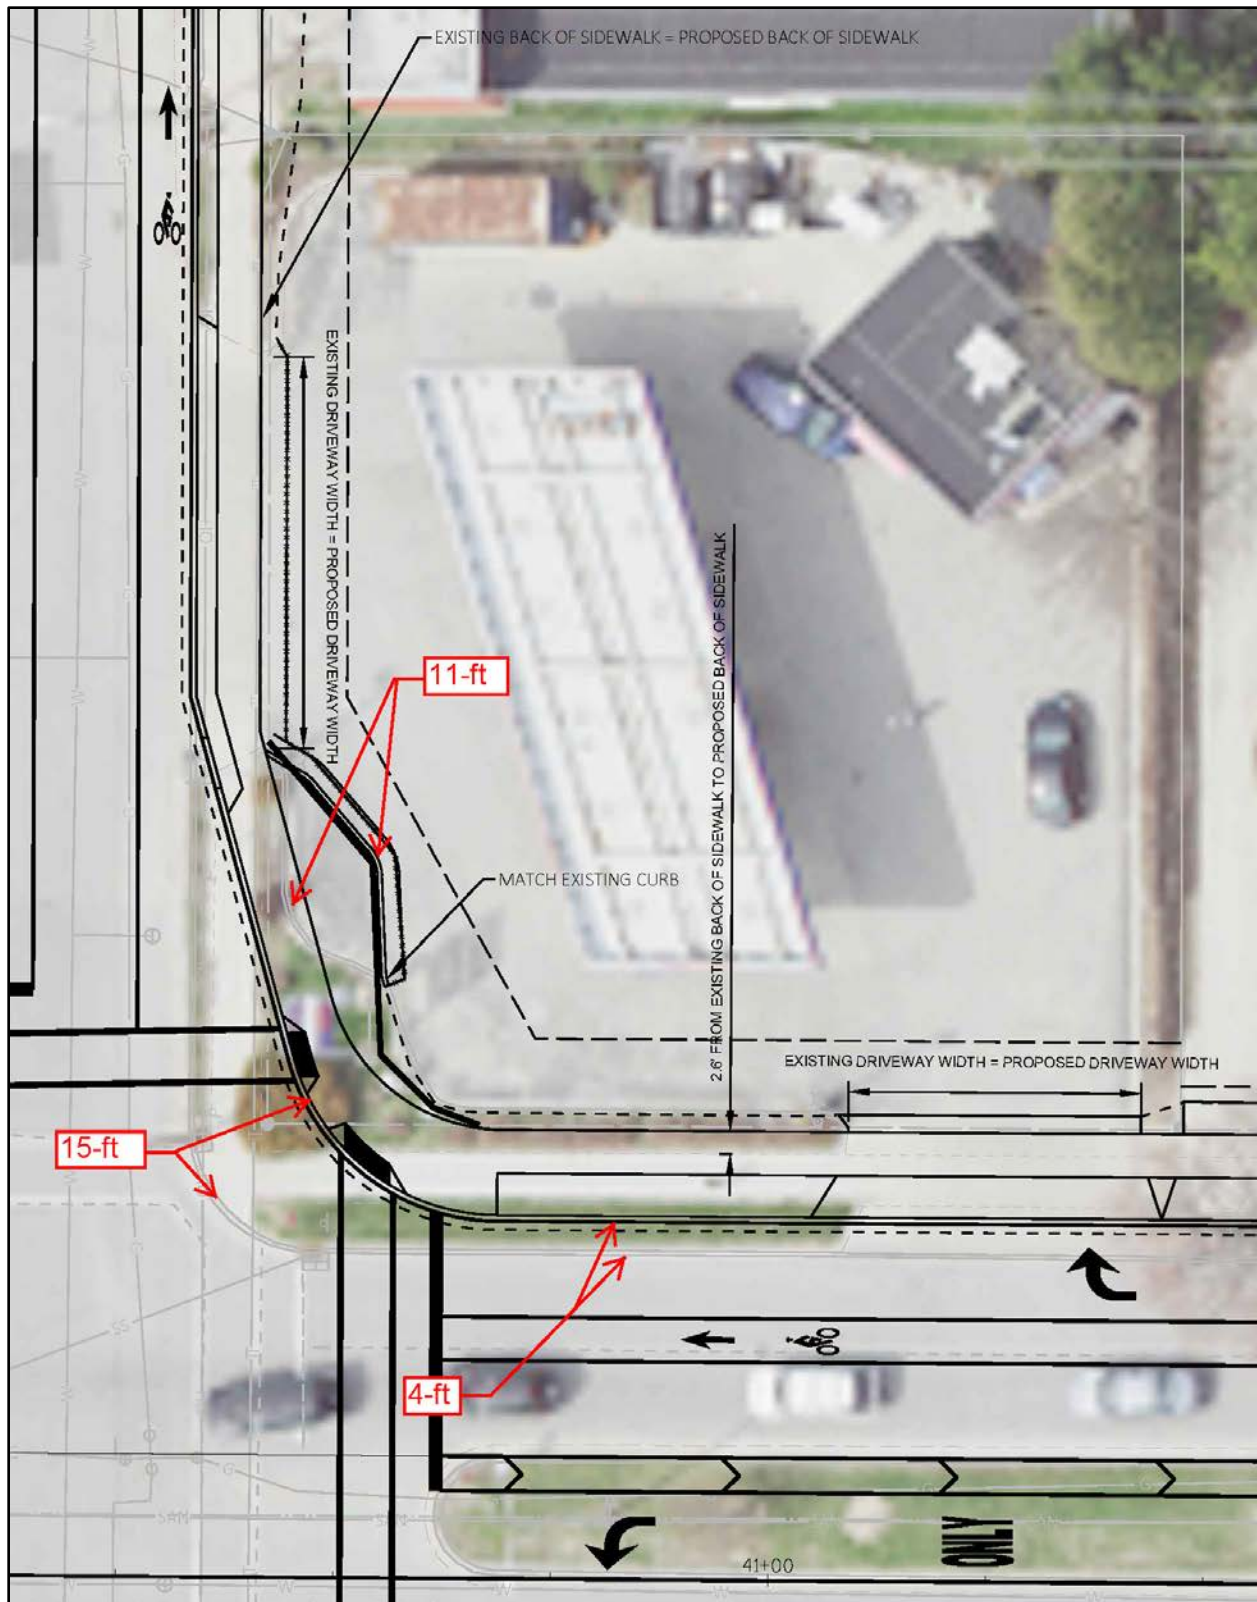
The former Clark Station is situated in the northeast corner of the North Avenue/15th Street intersection. The heavy, dark line to the southwest of the canopy illustrates the proposed new edge of the apron.
